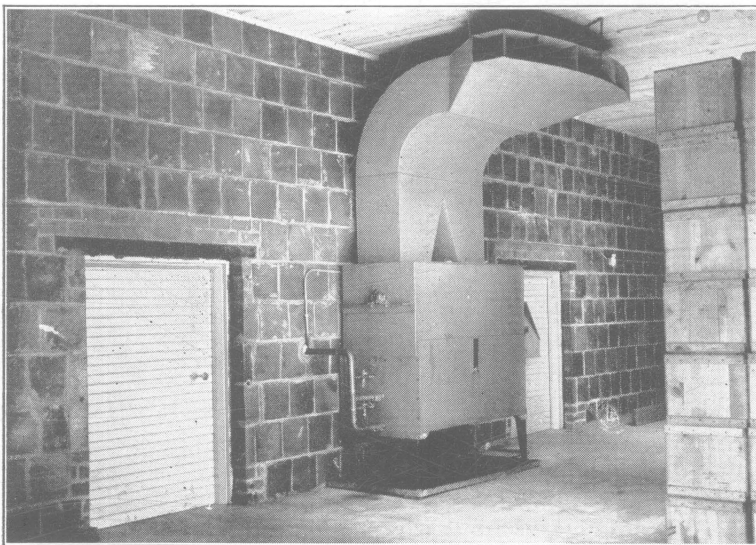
A cooling unit or evaporator installation in a 40- by 60-foot storage room
